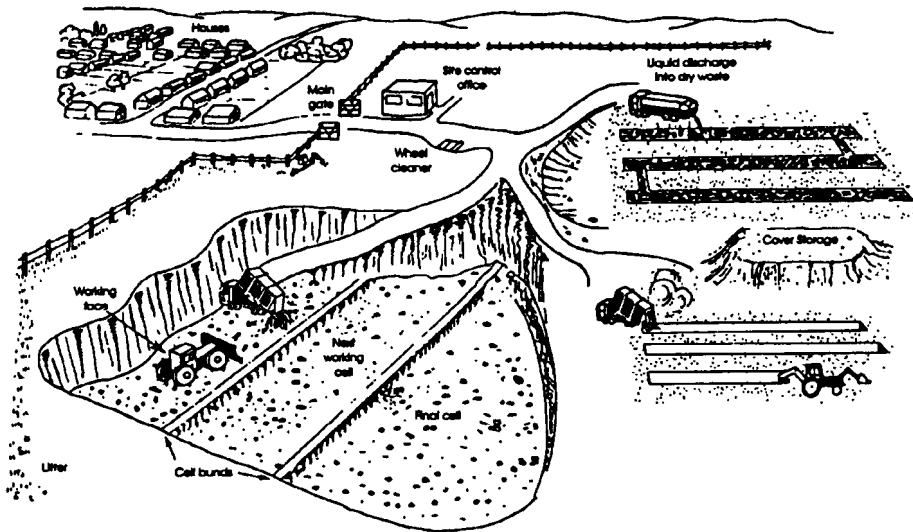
Typical Co-disposal Landfill Site (source: Batstone, 1989)
